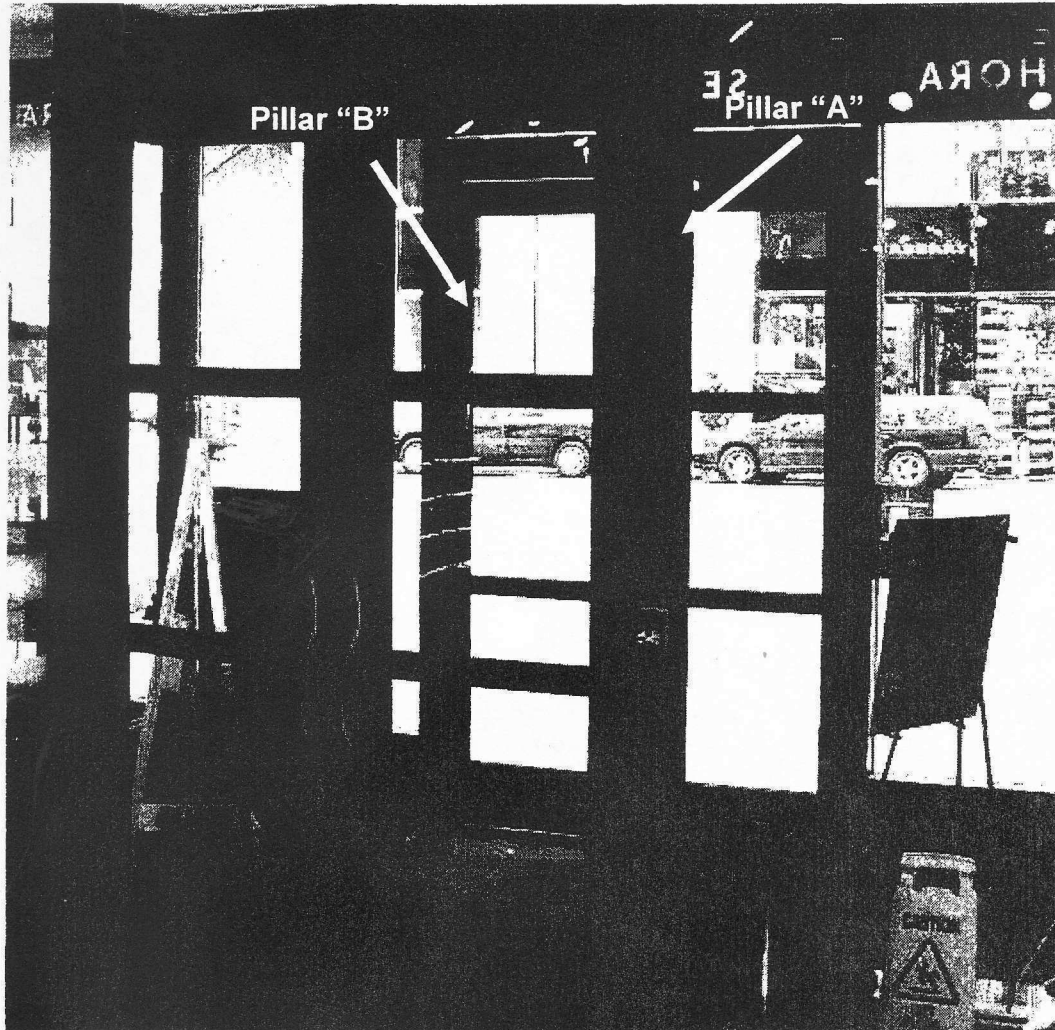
Interior frame pointing north to Bloor Street West from inside Sephora (TSV 00546.09 012)
